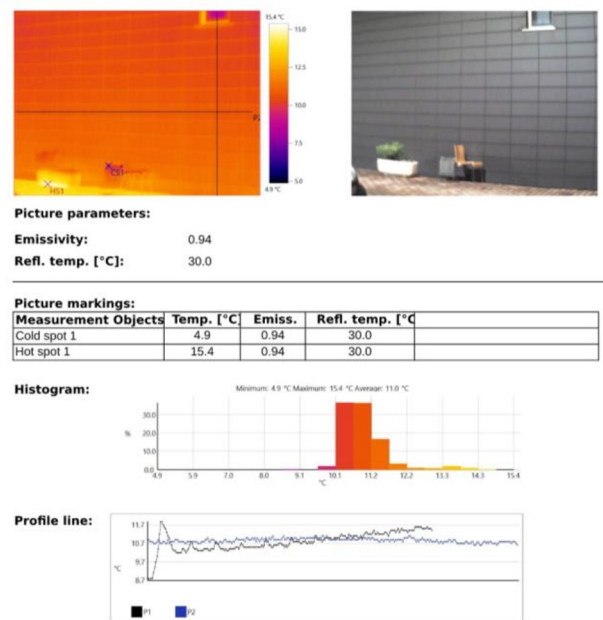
Thermal photo of the masonry wall with ventilated facade. (Source: Authors).
